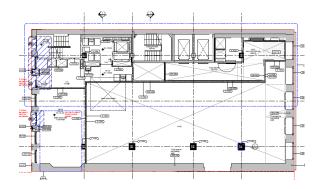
Beneficial House—Floor Plan, Wynyard Lane level—showing proposed new stair and lift. (Source: Make + Architectus, A-285-11-05-0, 17 April 2019, similar to DA 2005 set issued 14 February 2017)
